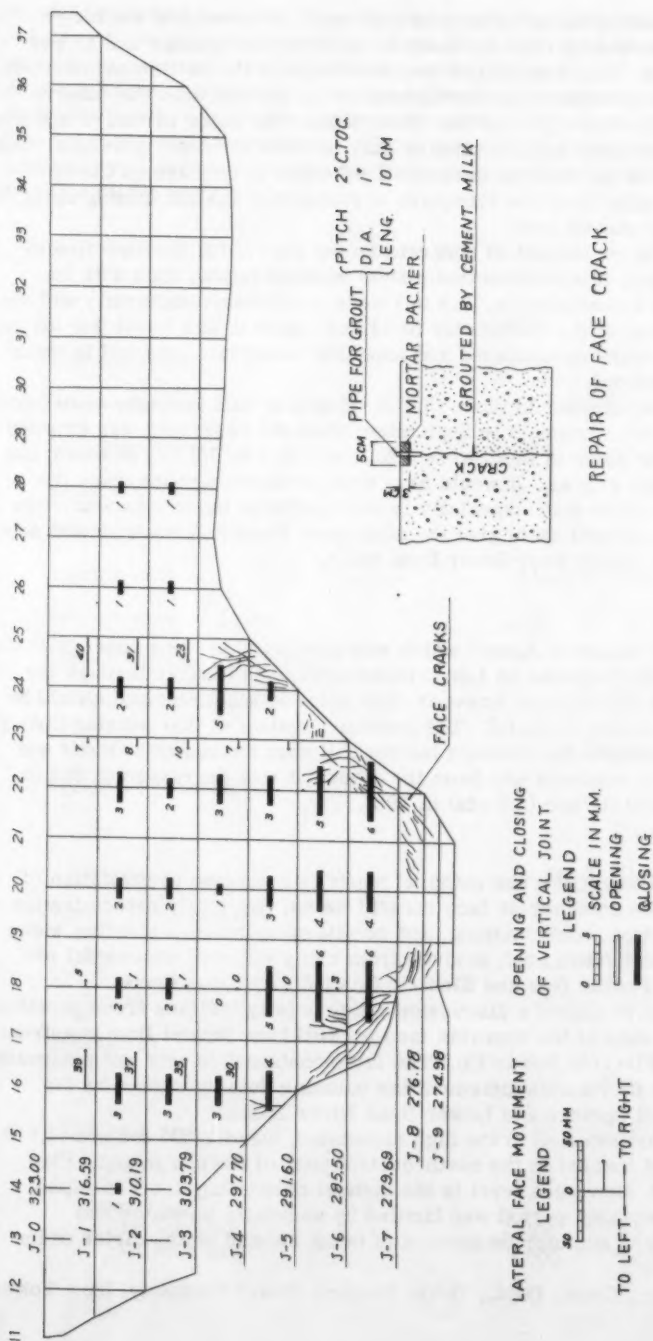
OPENING AND CLOSING OF VERT JOINT FACE CRACKS AND LATERAL MOVEMENT - ISHIBUCHI DAM
